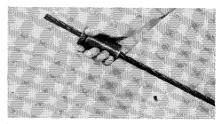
The chuck size should be double checked, and careful attention must be given to placement of the chuck to insure that its axis coincides with the axis of the strand. Incorrect alignment can lead to notching and shearing of the strand wires, thus causing a strand failure.
